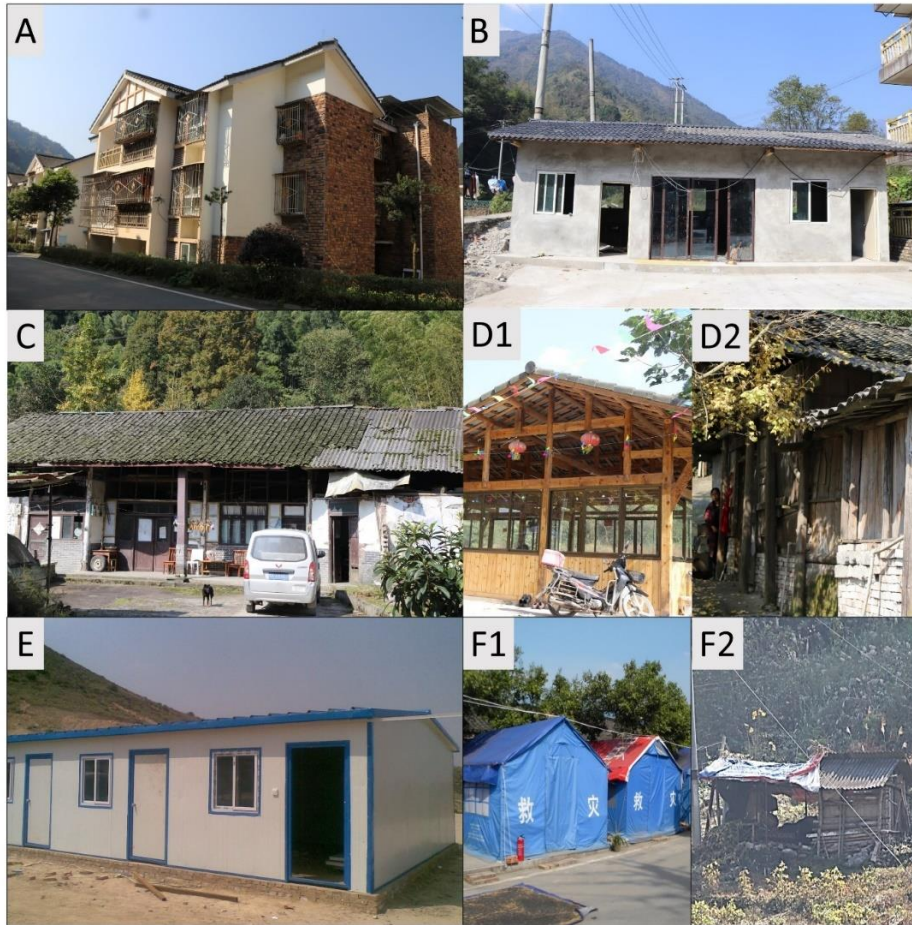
Examples of building construction types in the study area. A: RC frame (RCF) structure residences built by the reconstruction teams from Shanghai city. B: reinforced masonry (RCM) building of a 195 hostel. C: wood and brick residence (WB). D1: wooden structure (W) serving as restaurant. D2: wooden residence with walls made by wooden plates and bricks. E: pre-fabricated metal (PFM) temporary houses. F1: tents distributed by the government. F2: a shack made from wood, asbestos tiles and waterproof cloth.
